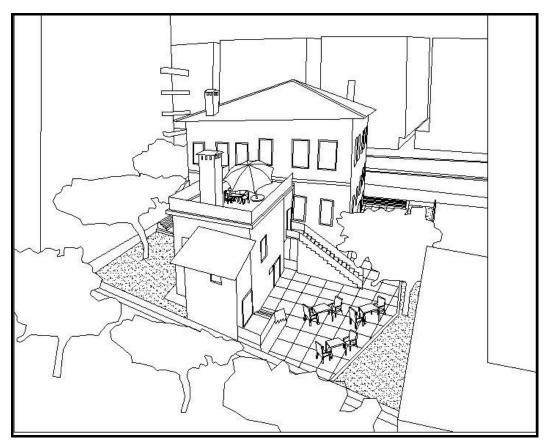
Conservation Proposal of Hasanağalar House – Perspective
